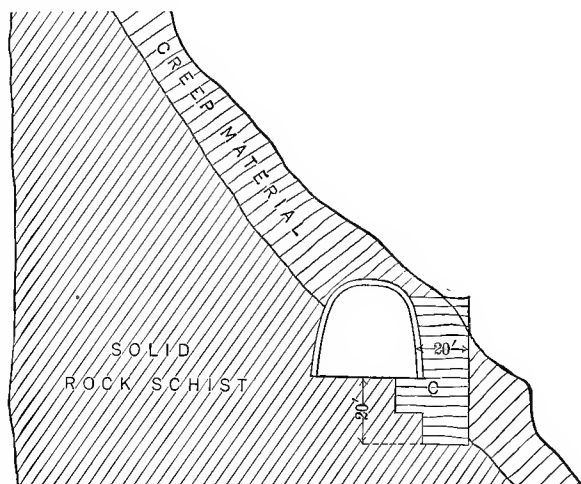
Section showing position of Mühlthal tunnel and creep material on Brenner Railroad. (After Drinker, Tunneling.)
